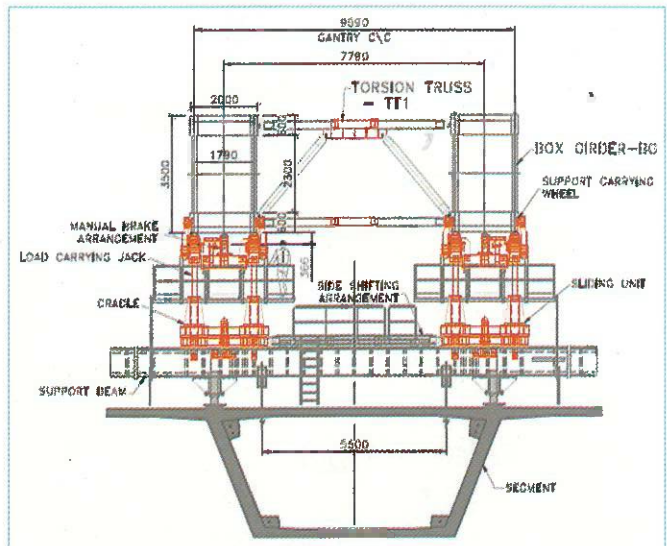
Launching Girder - Cross Section of Boxes & Nose Girder with Torsion Beam
